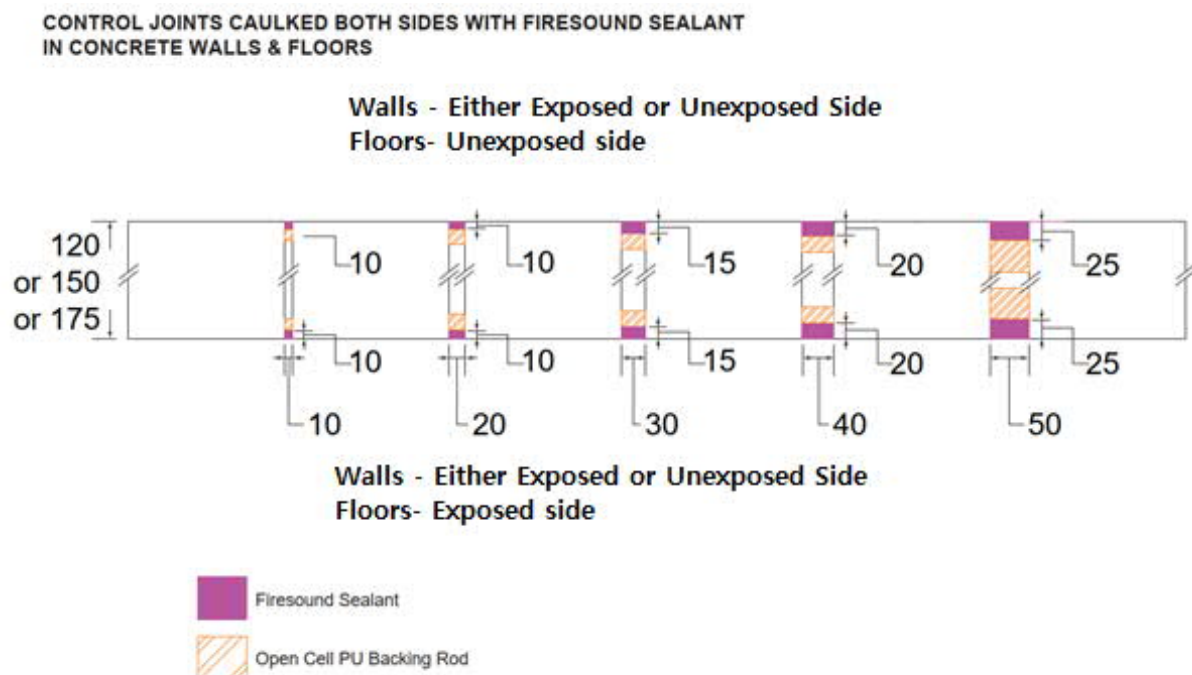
Control joints with HB Fuller Firesound sealant caulked on both sides in concrete walls and floors.
